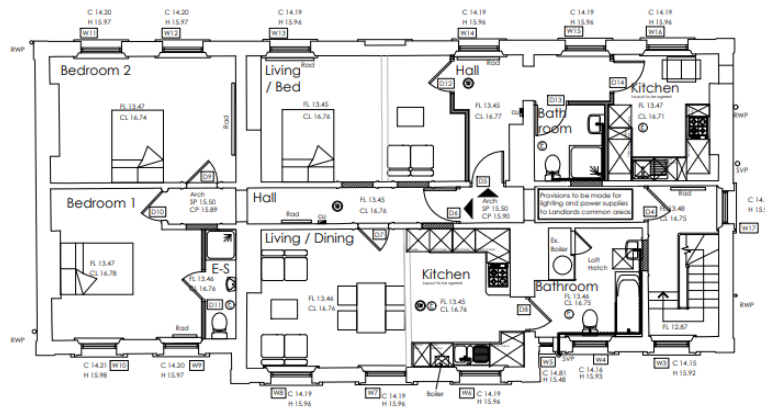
Area work plan for refurbishment on First Floor arrangements.
